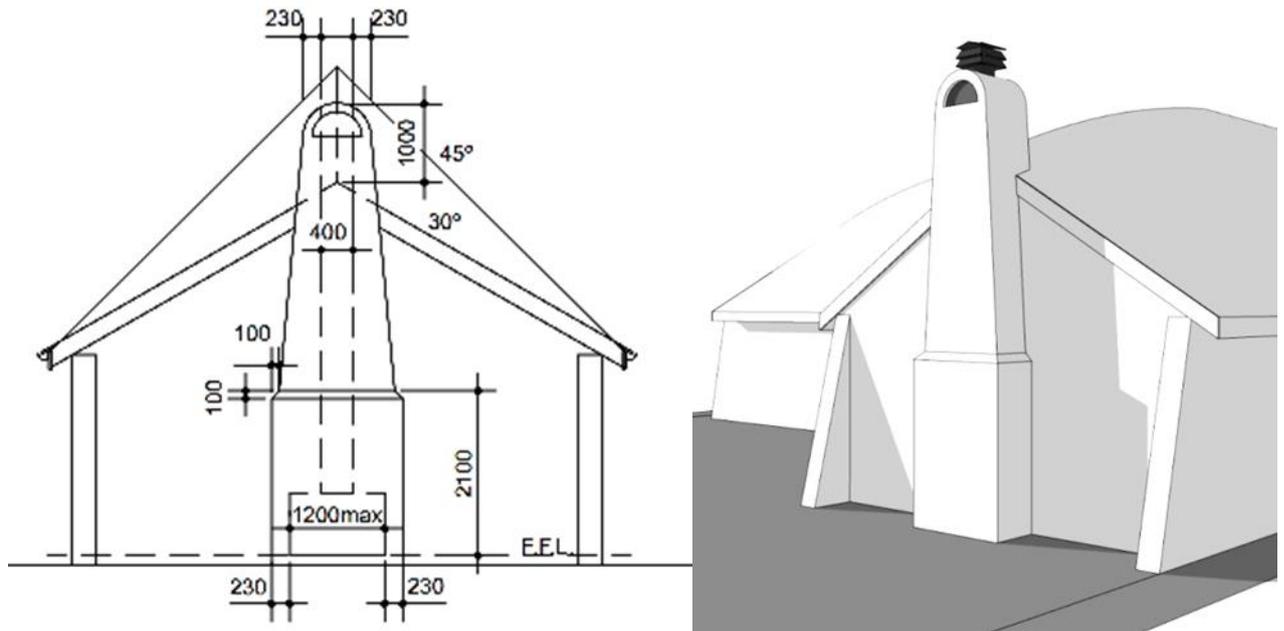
Typical external element of a fire place chimney design must conform to above proportions and dimensions. Any deviations must be submitted to ARC for consideration.
